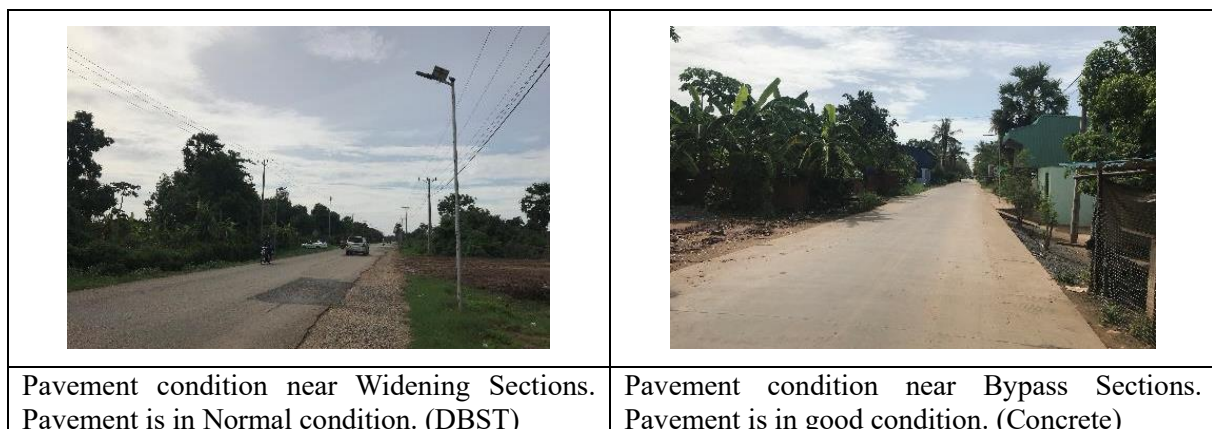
Pavement Condition (Akreiy Ksatr Side)
